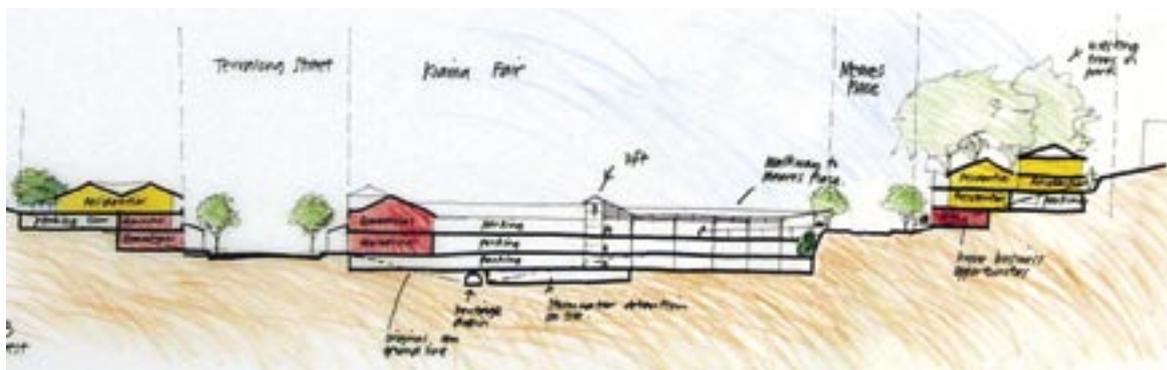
Indicative north-south section through site showing decked parking with access from both Terralong Street and Meares Place.
